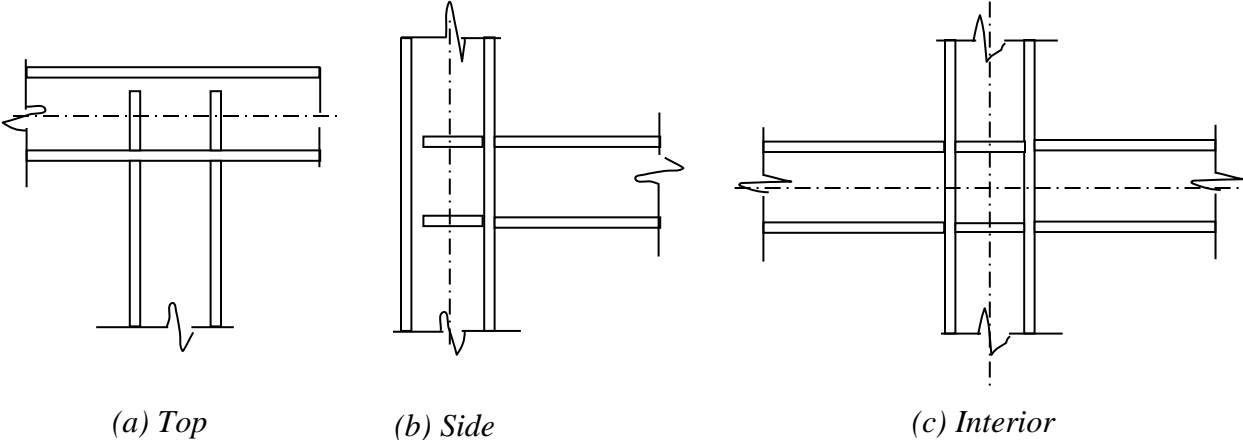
Beam to column connections of (a) Top, (b) Side, and (c) Interior Type
